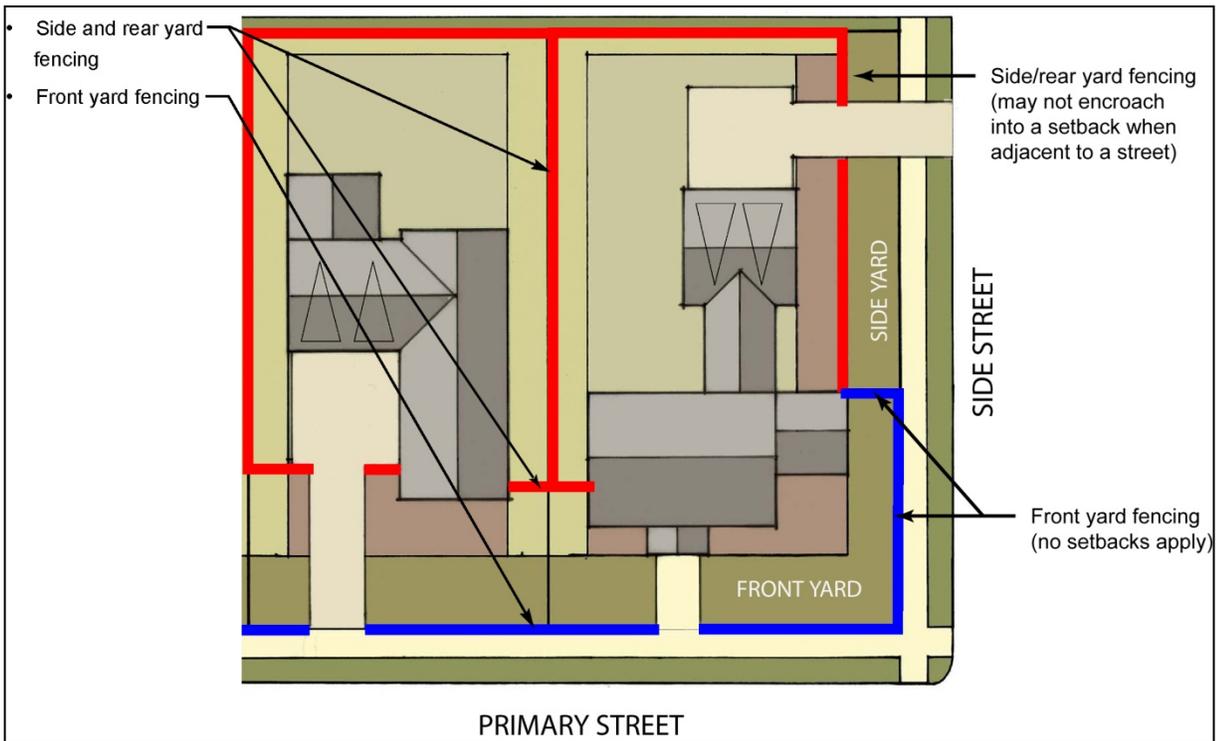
Fence and wall height is determined by the wall or fence's location relative to the streets fronting the lot and the structure's front and rear façades
